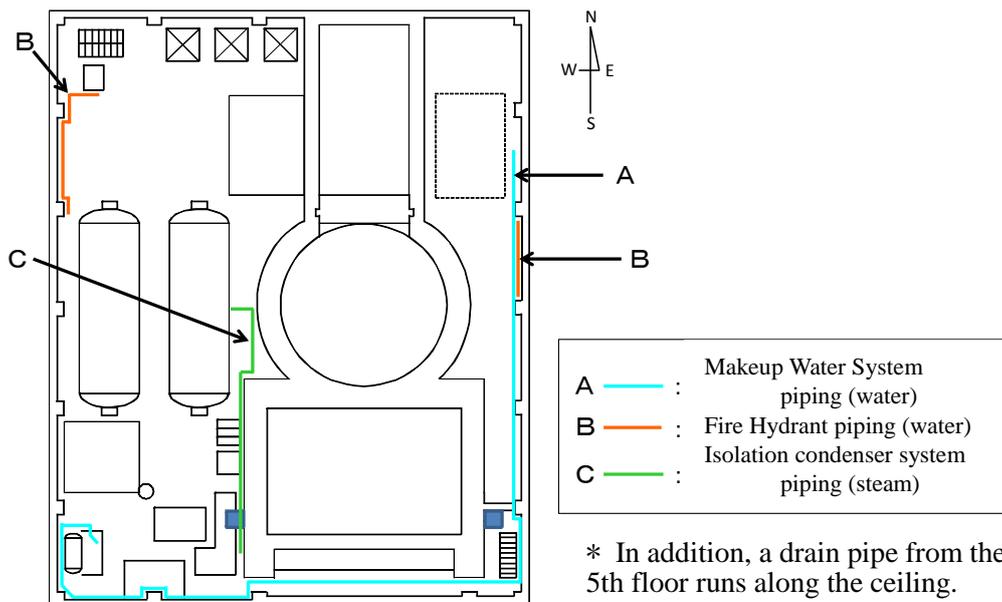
Water and Steam Pipes installed on the 4th Floor of the Reactor Building of Unit 1
